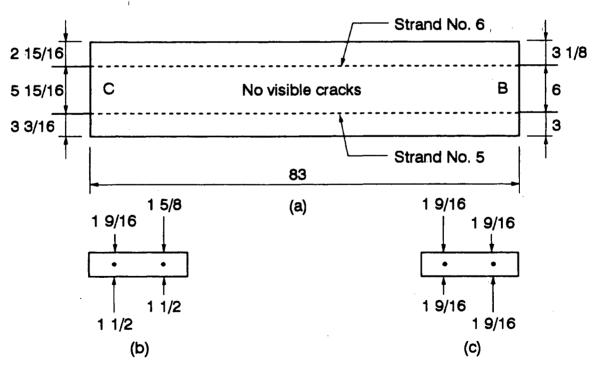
Specimen No. 3-3.0TC-6 (dimensions shown in inches): (a) plan view; (b) end view at C; (c) end view at B
